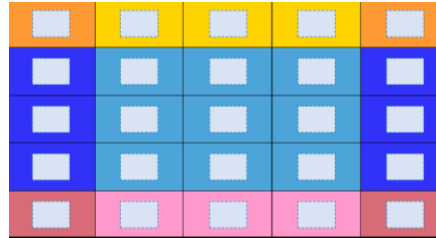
Scheme of the Building Concept façade with typical thermal zones.
